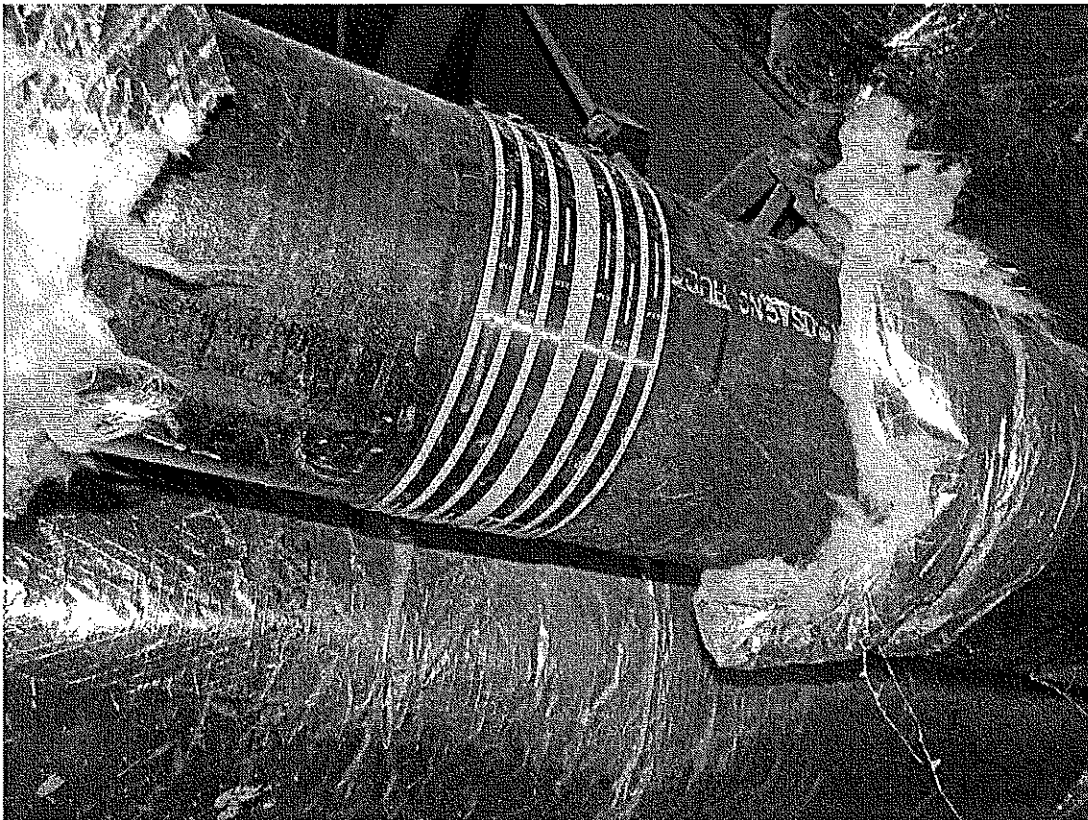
Typical Hubless Coupling with Stainless Steel Bands Securing an Elastomeric Sleeve
